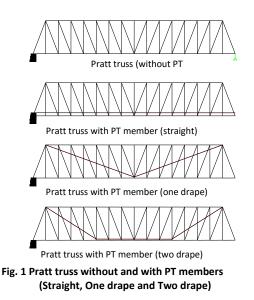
Pratt truss without and with PT members (Straight, One drape and Two drape)
